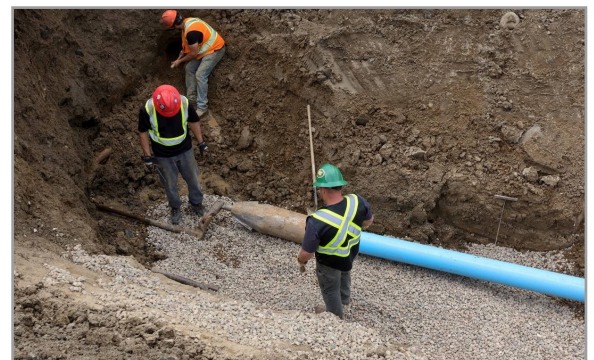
Attachment of Pipe Bursting Expander to Bursting Rods
